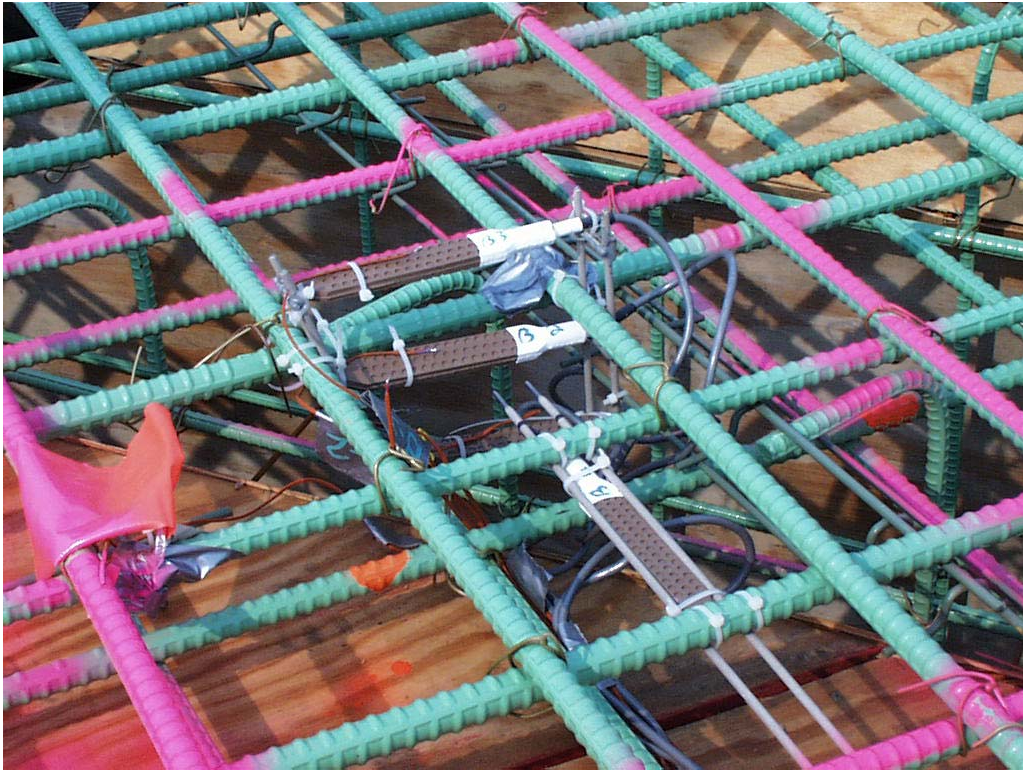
Sensors installed at location B, over pier, center of deck, Big Creek
